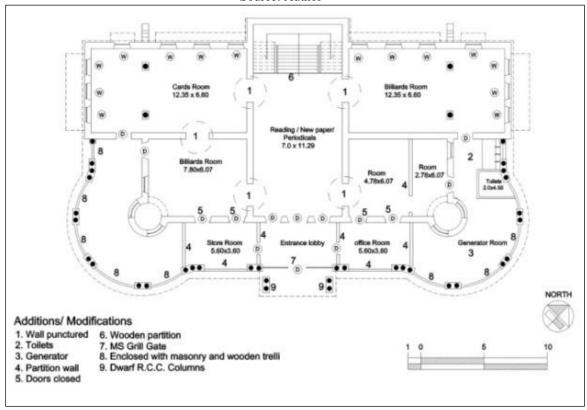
Victoria Jubilee Town Hall First floor plan Source: Author
